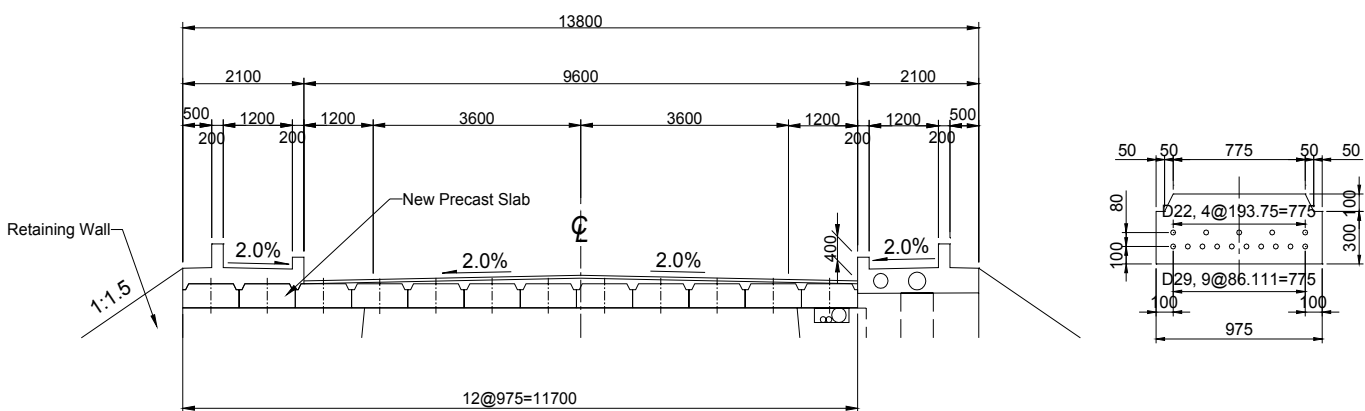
Arrangement & Typical Cross Section of New Precast RC Slabs for Meyungs Causeway
